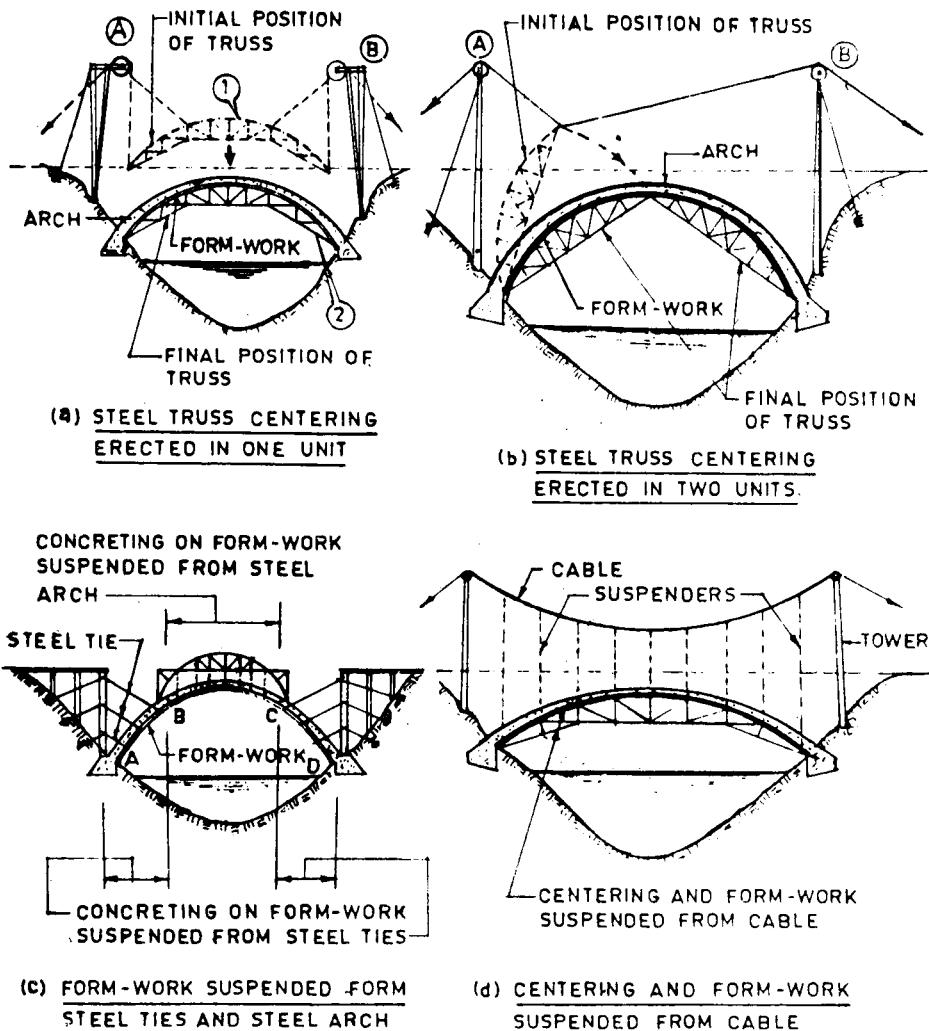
CENTERING AND FORM-WORK FOR ARCH BRIDGES
